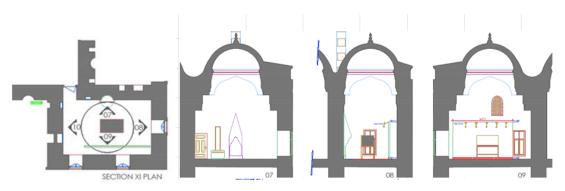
Plan and sections according to the Interior Design Project by Paralel 41 Architecture (Archive of Istanbul Ist. RDF)
